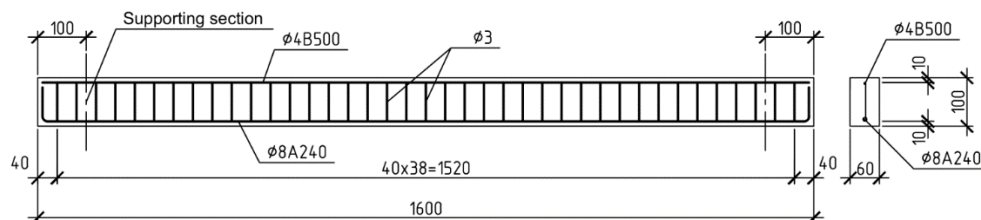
Reinforcement scheme for samples of reinforced concrete beams.
